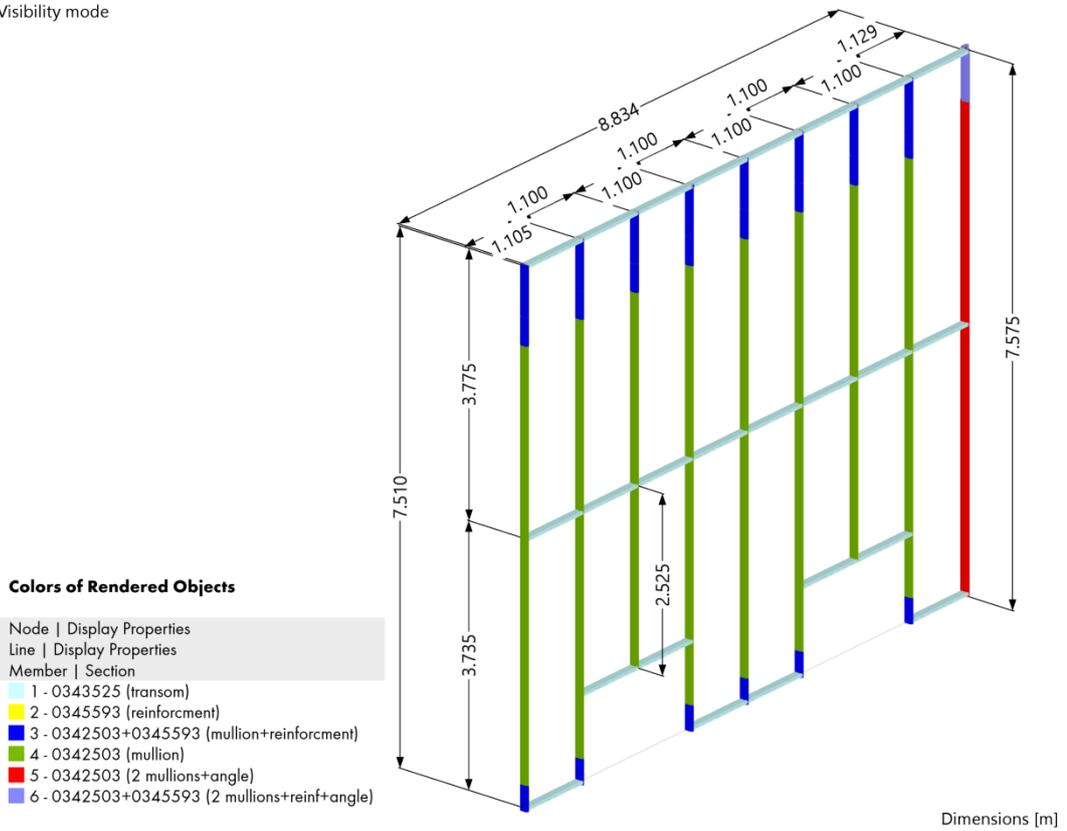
Curtain wall 23-08 Elevation A FEA model (extract from RFEM 6.02)
